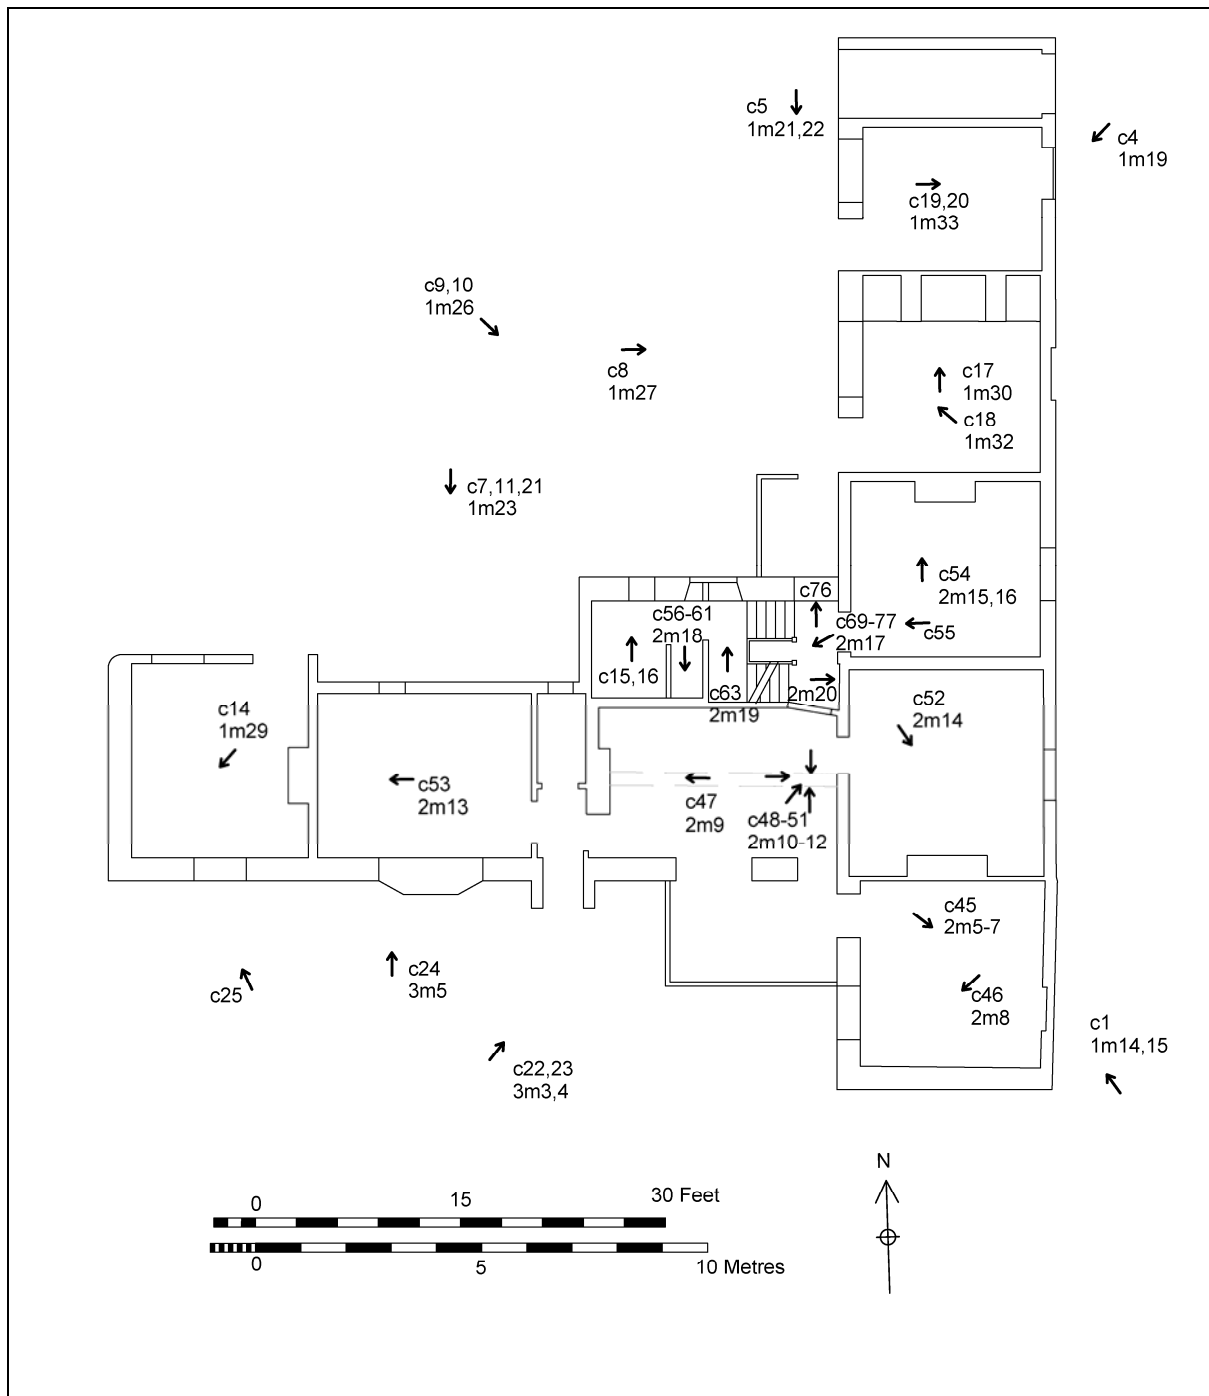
Farmhouse, ground floor, with location of archived photographs added
